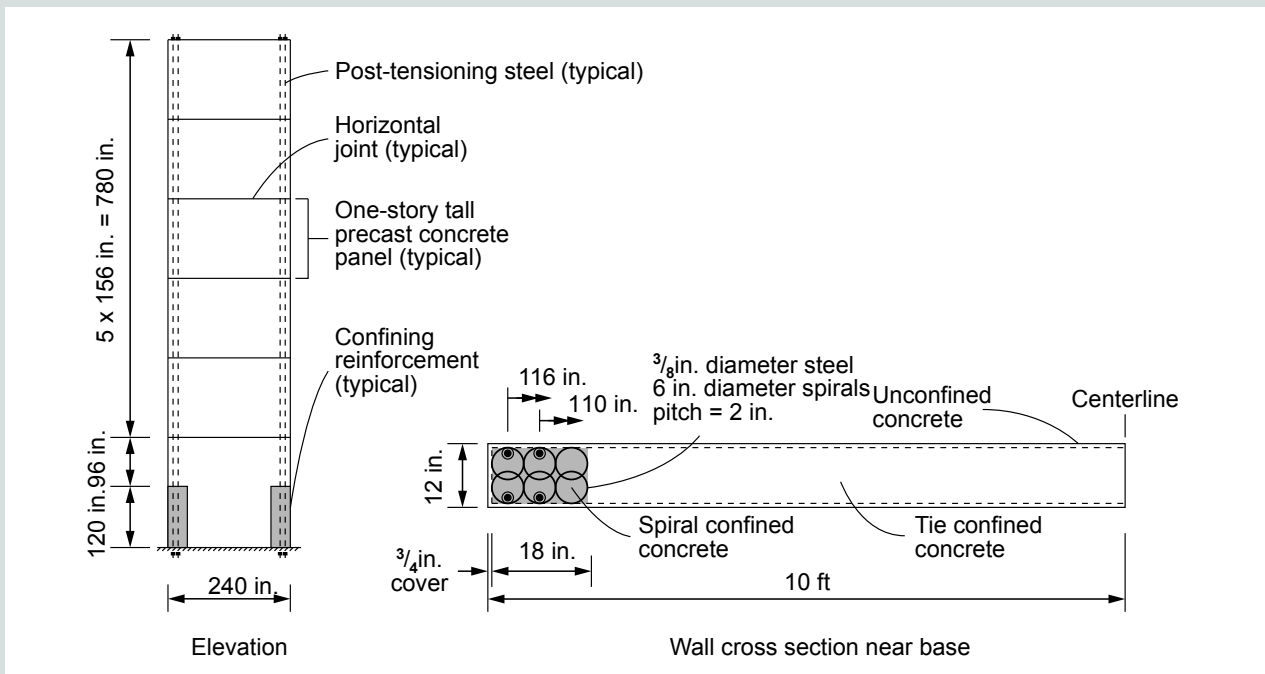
Unbonded post-tensioned precast concrete wall. Source: Adapted from Kurama et al. (1996). Note: 1 in. = 25.4 mm; 1 ft = 0.305 m.
